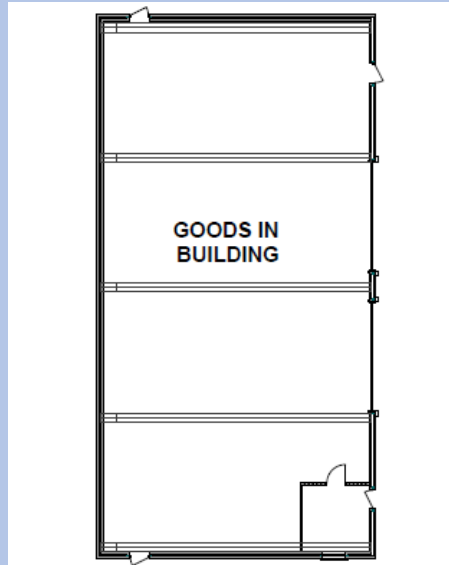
Zone 1. Goods in Building- Floor Plan (Image not to scale).
